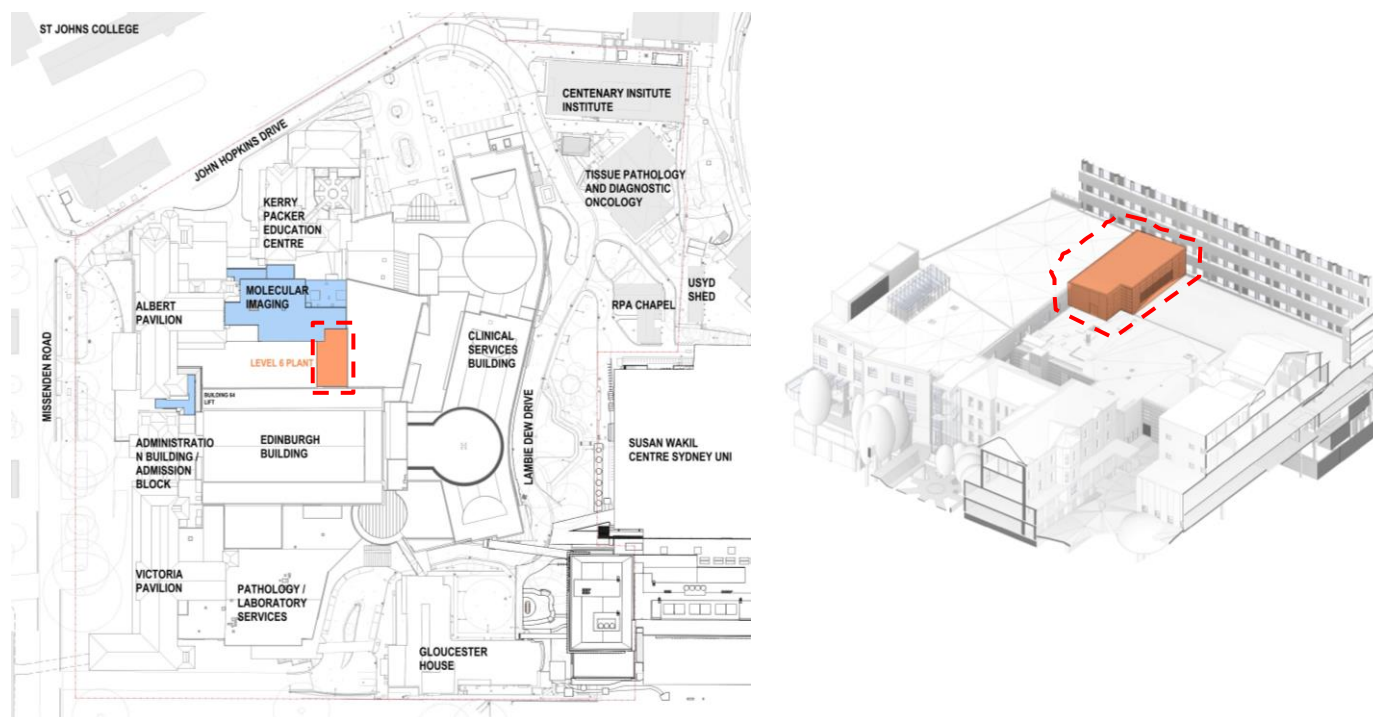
Overall Site plan (Royal Prince Alfred Hospital Campus) & Axonometric of Proposed L6 Plant room to serve Emergency Dept (proposed plant room shown in dashed red line)
